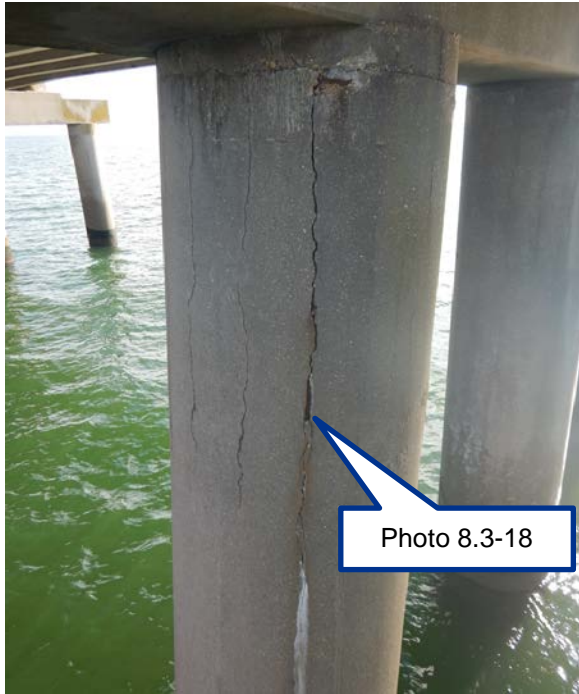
BNB129 Pile A – Wide Crack along Exposed Prestressing Strand with Efflorescence and Rust Staining (Looking Northeast)
